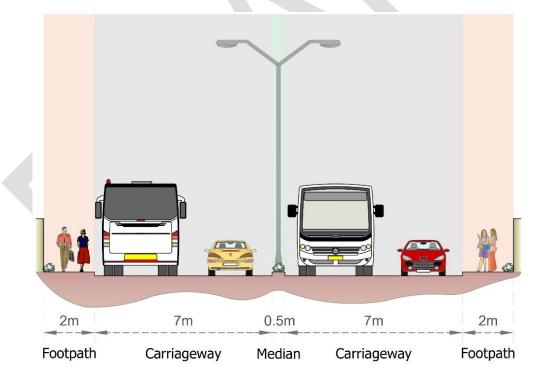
Typical Cross Section of 18.5m Wide Road with Footpath
